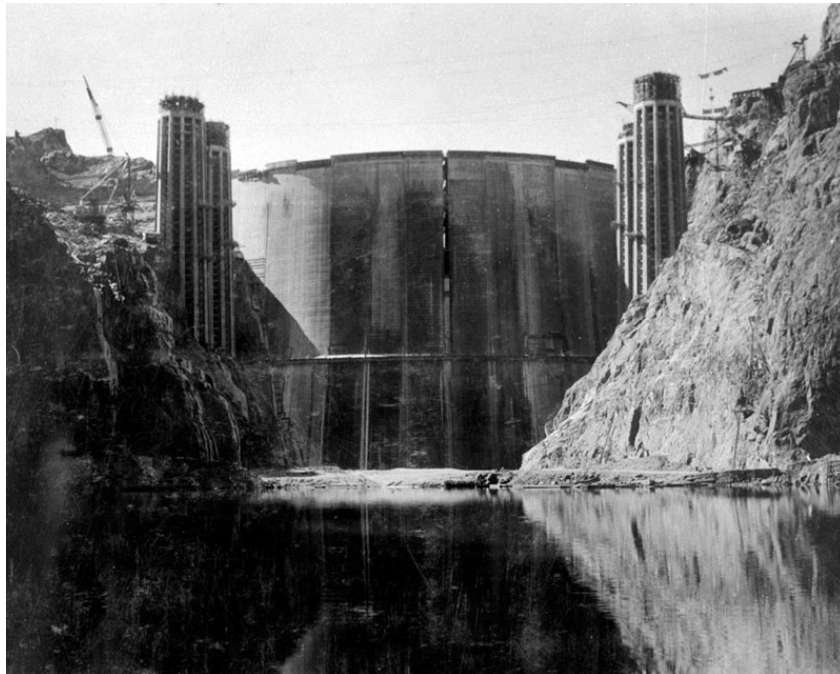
Hoover Dam intake towers and top of cofferdam.
